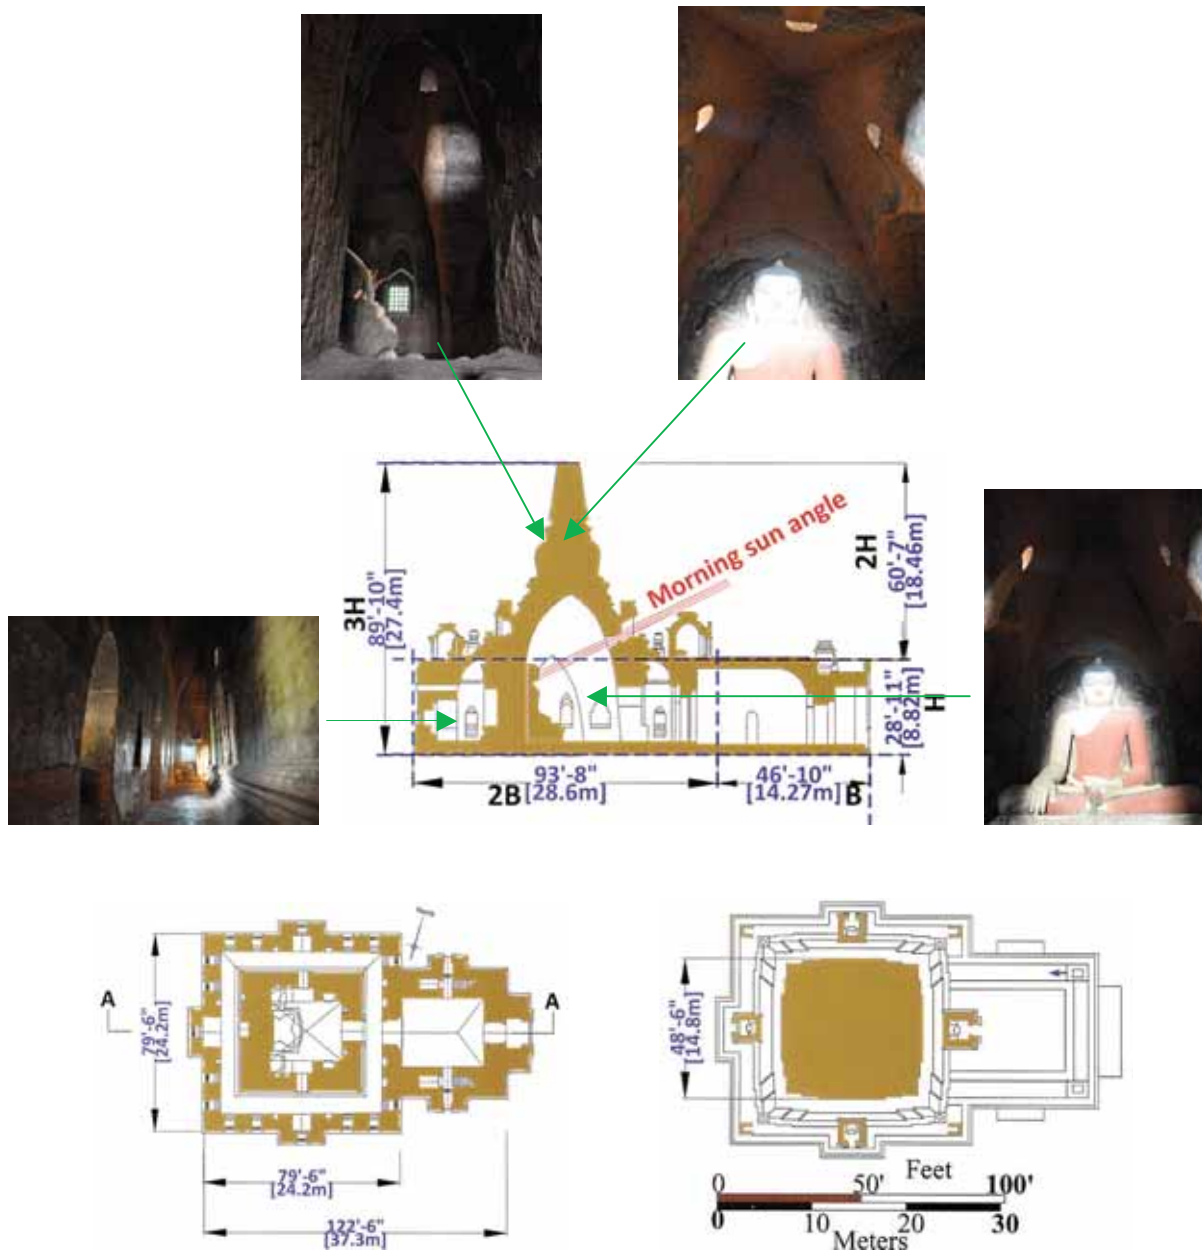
Section, ground floor and upper floor plan of Pa-Hto-Tha-Myar temple
